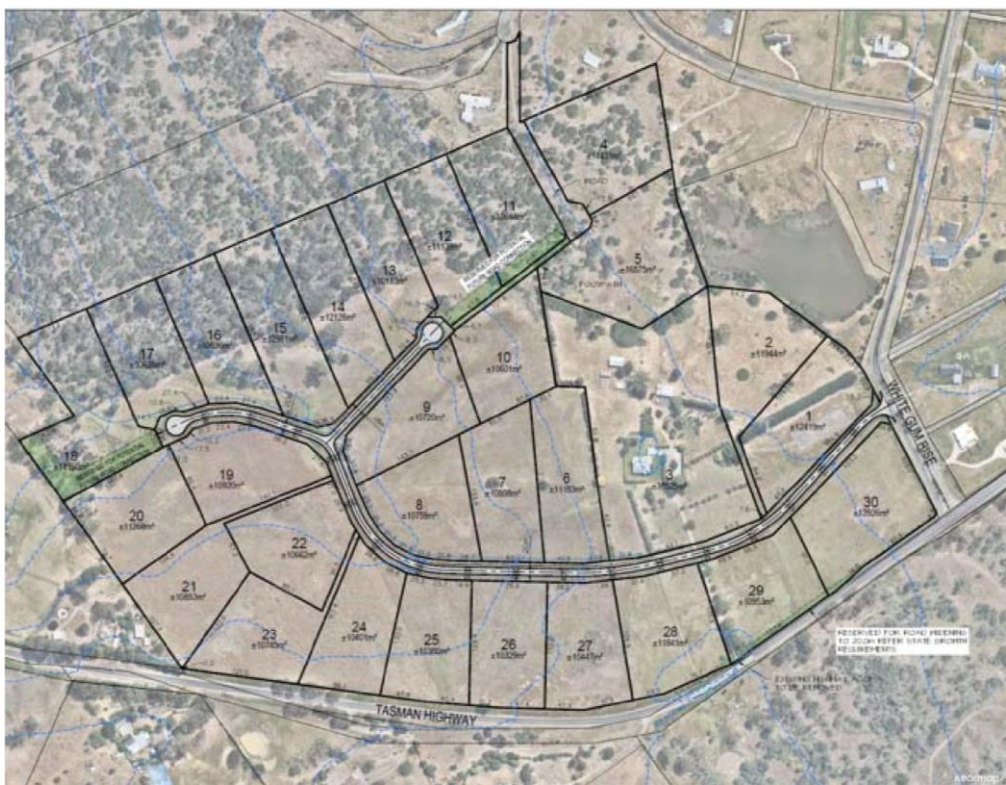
Proposed Plan of Subdivision (source: Planning Submission, 6ty Pty Ltd)
